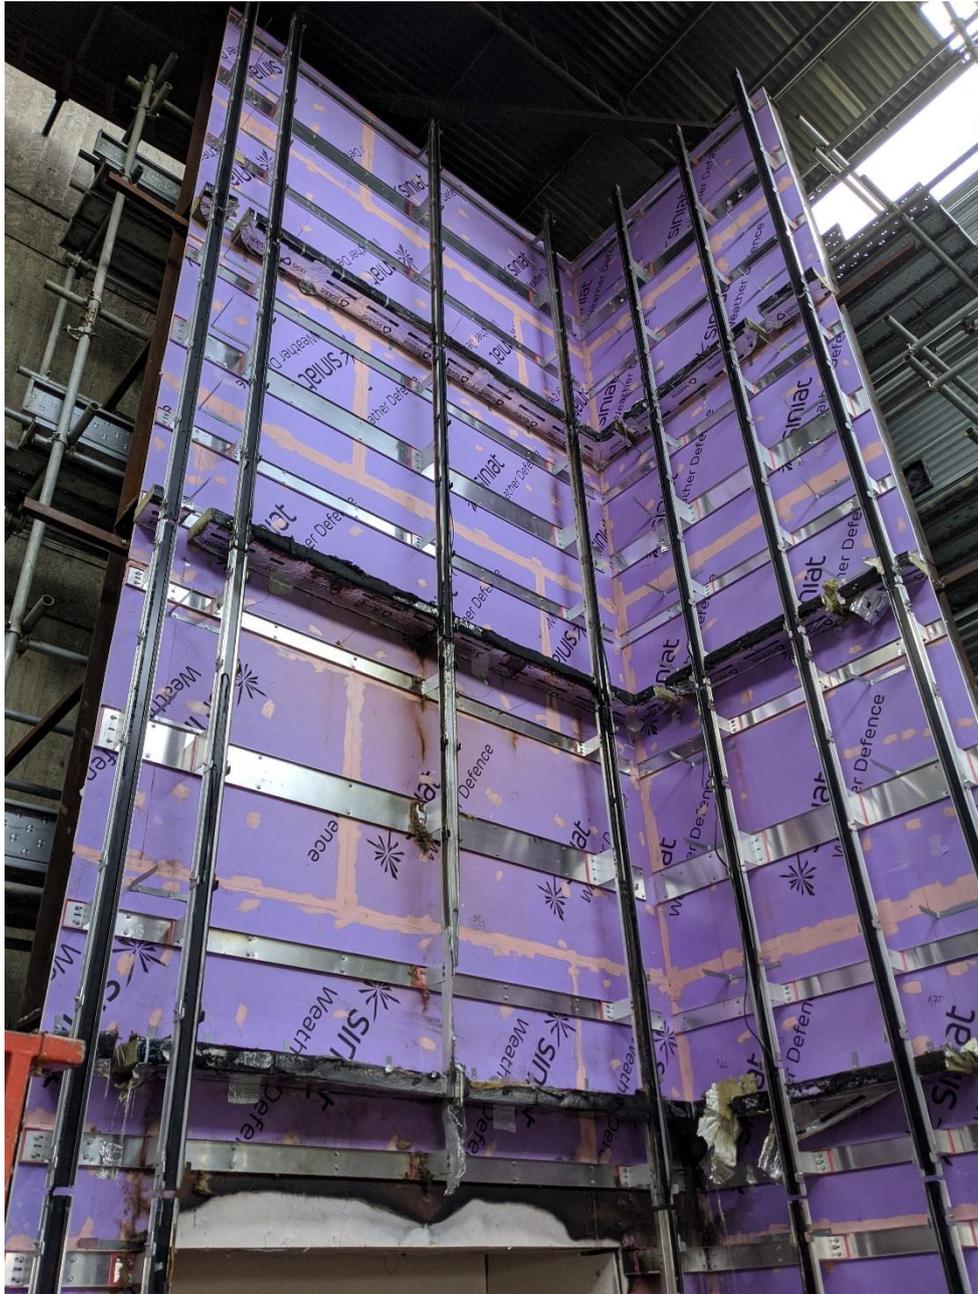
Insulation removed, light scorch marks on sheathing boards visible and damage to vertical rails clearer
